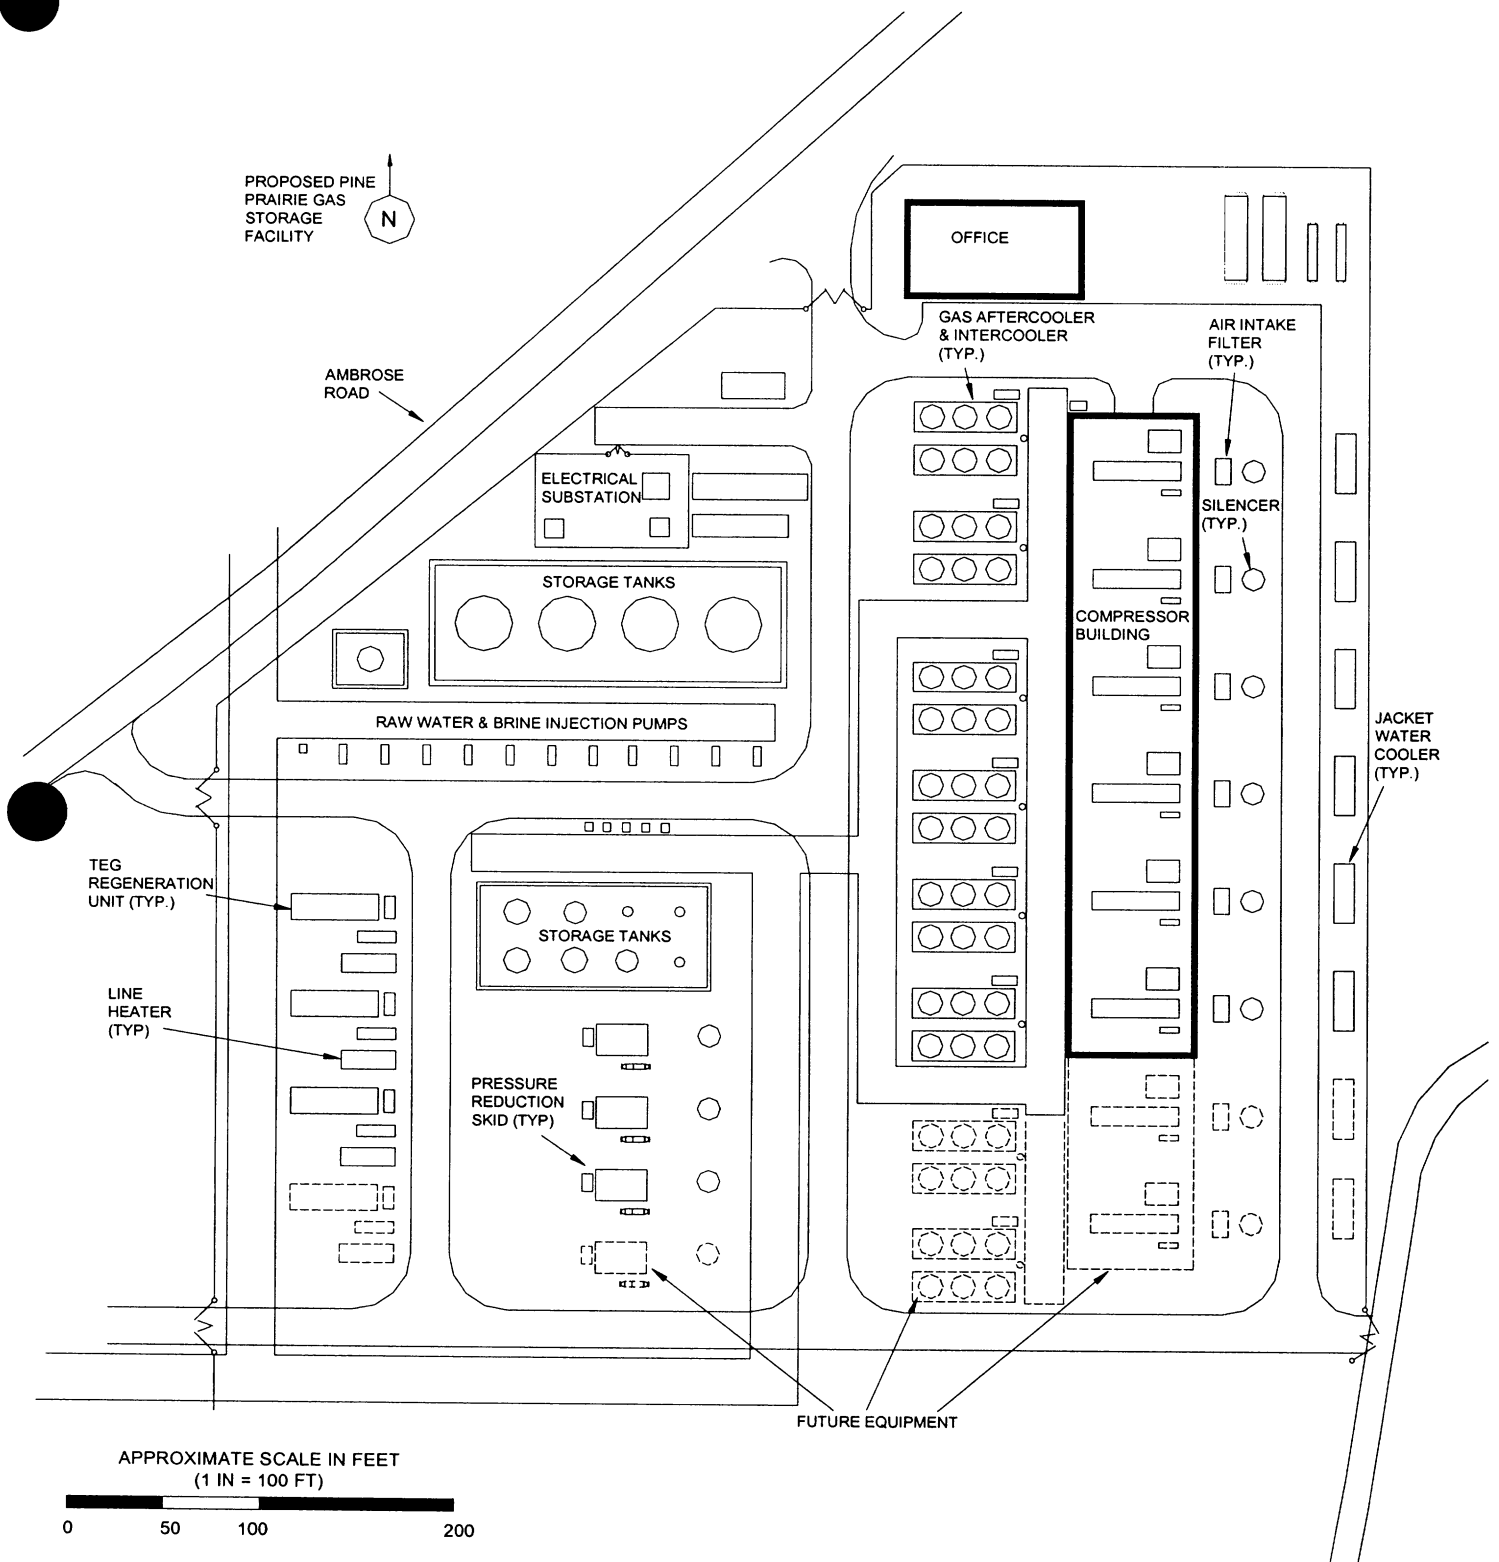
Pine Prairie Gas Storage Facility: Anticipated Layout of Buildings, Equipment and Property Line for the Facility.
